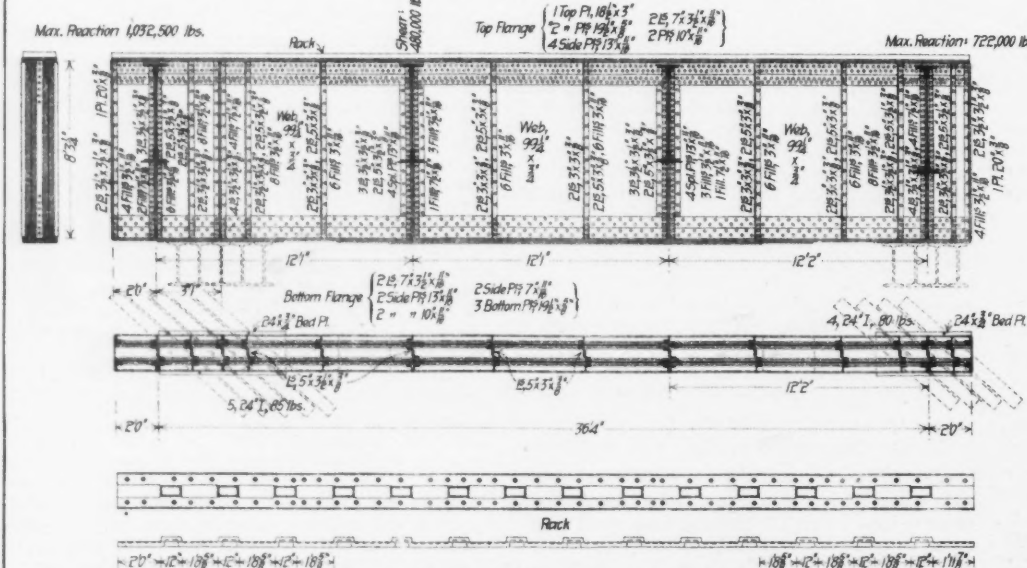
TRACK GIRDER AND ROLLING RACK.
